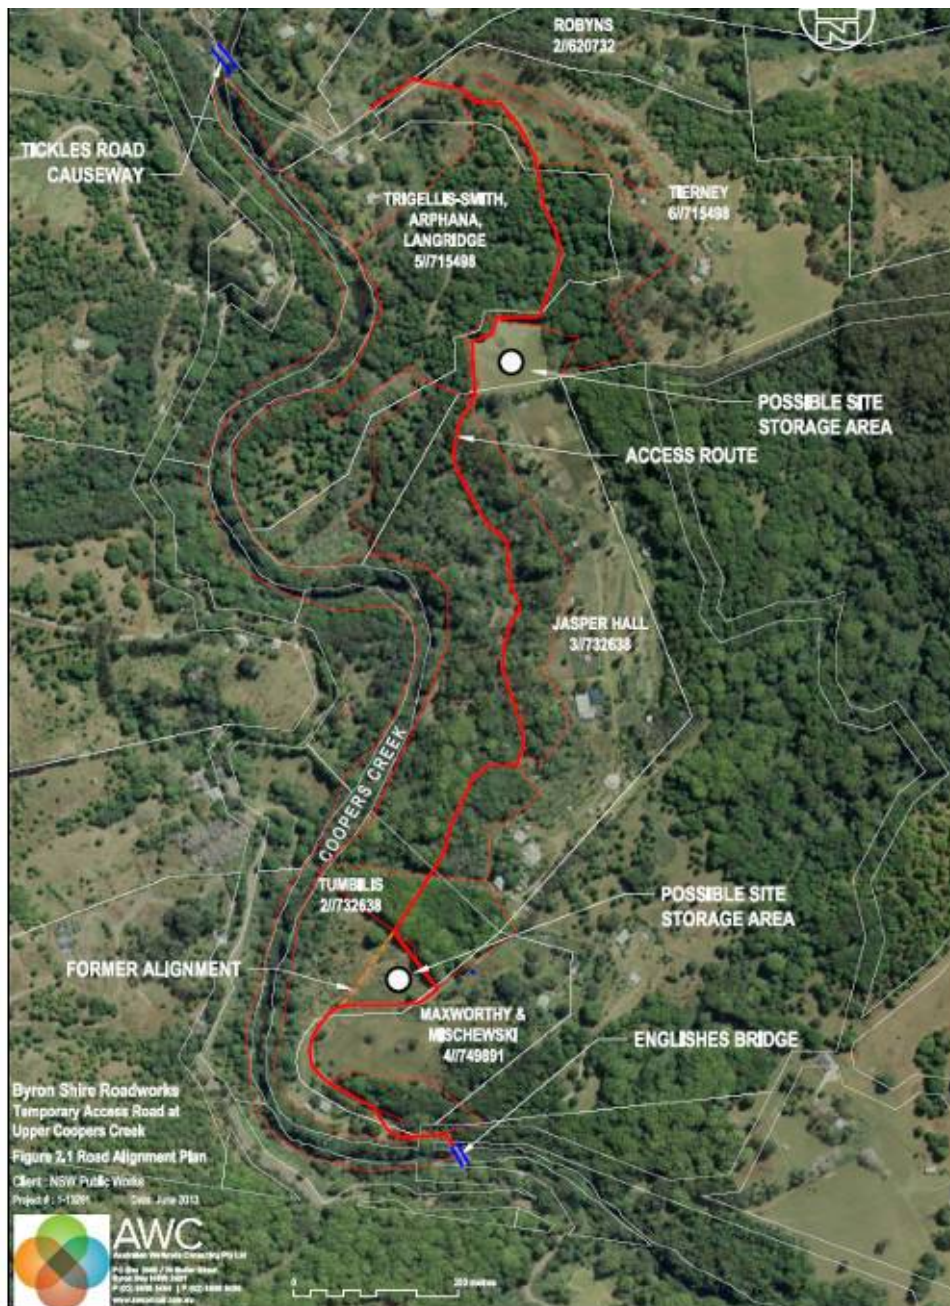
Proposed alignment of the temporary road (bold red line) and affected properties
